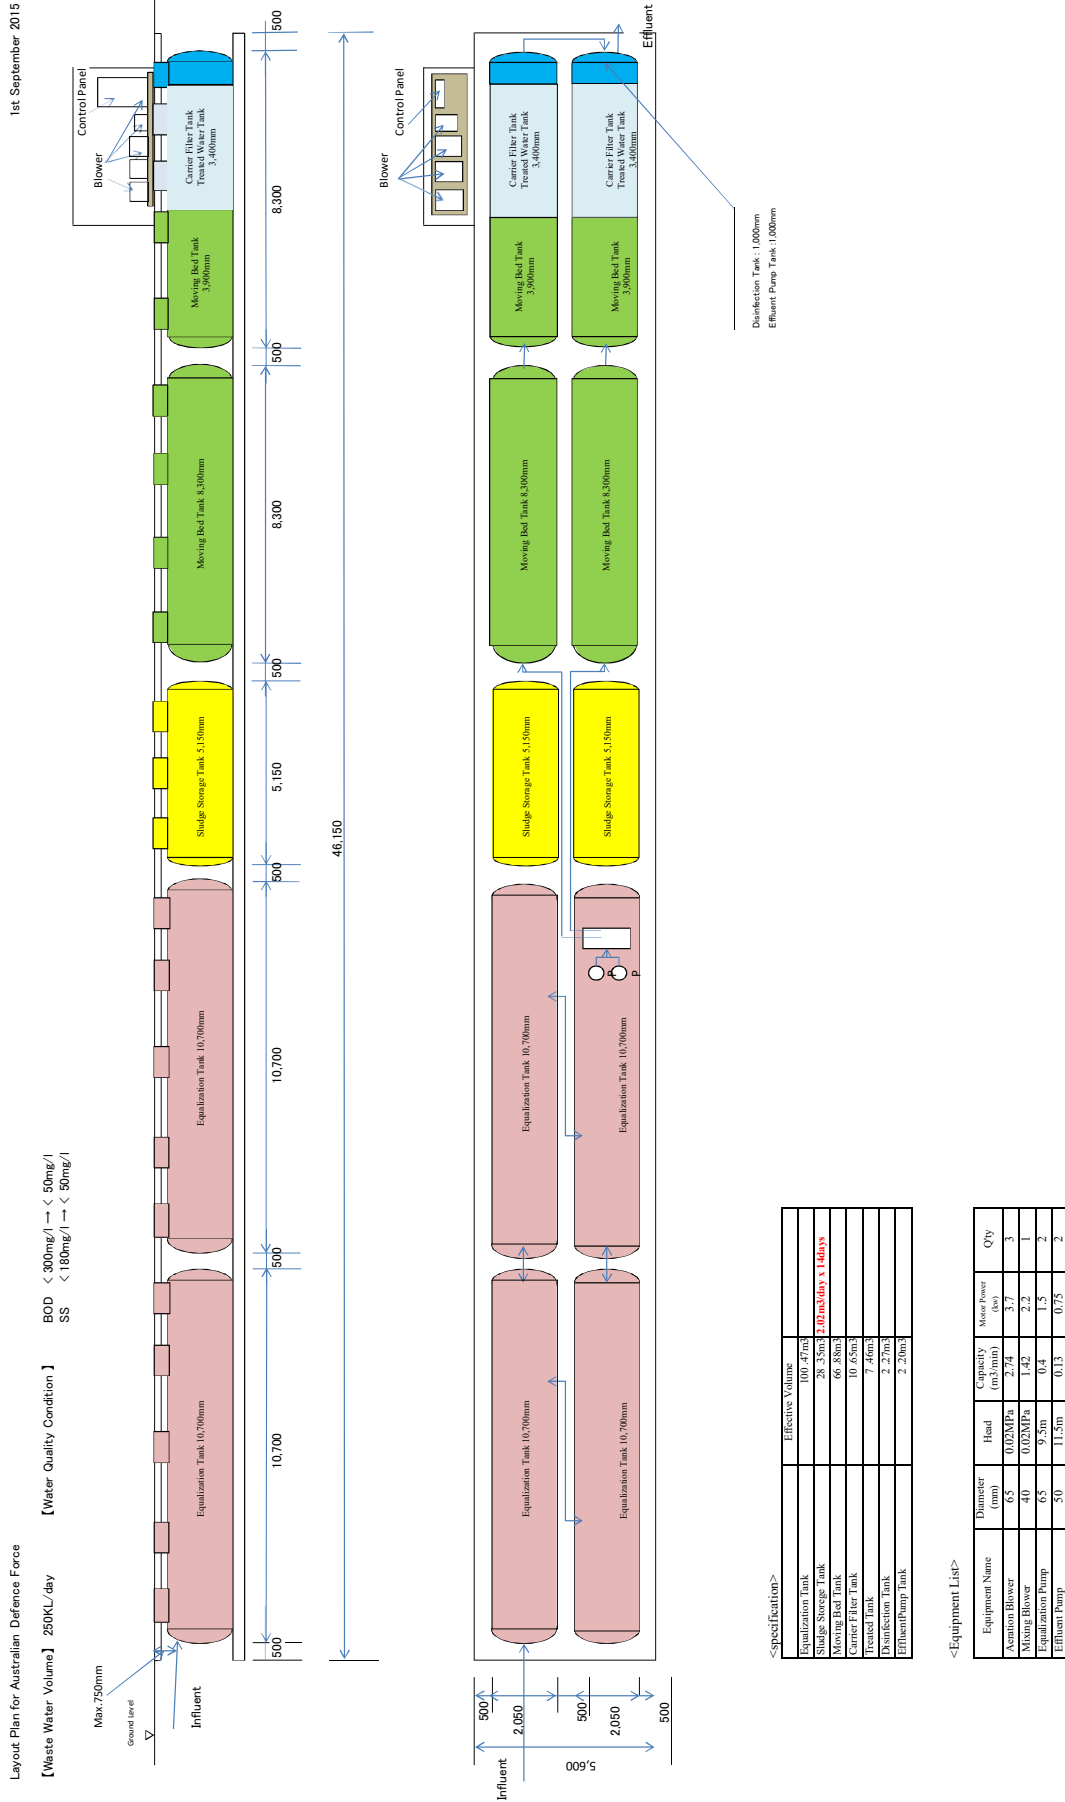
Layout Plan – Australian Defence Force, Igam Barracks
